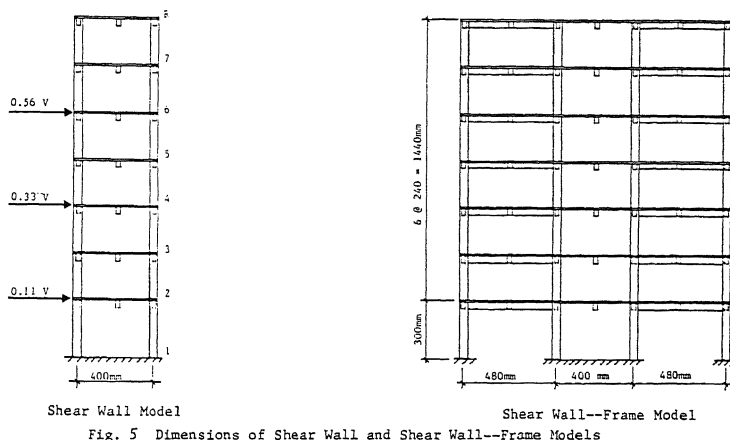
Dimensions of Shear Wall and Shear Wall--Frame Models
